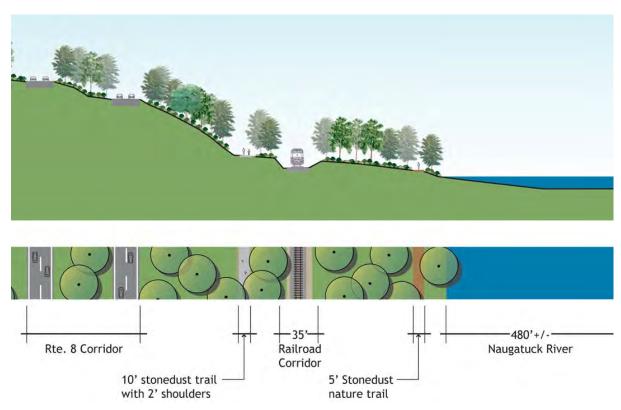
Trail cross-section north of Frost Bridge Road (Route 262) showing the greenway trail's relationship to the Naugatuck River, the Naugatuck Railroad and Route 8.
